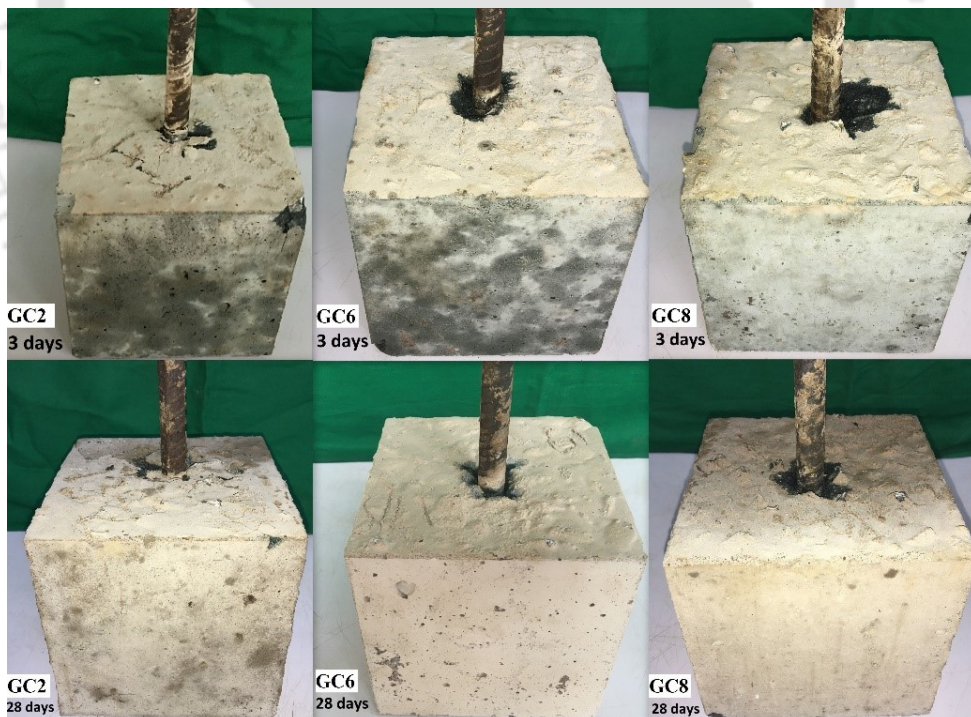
Pull-out test specimens without any visible crack after failure.
